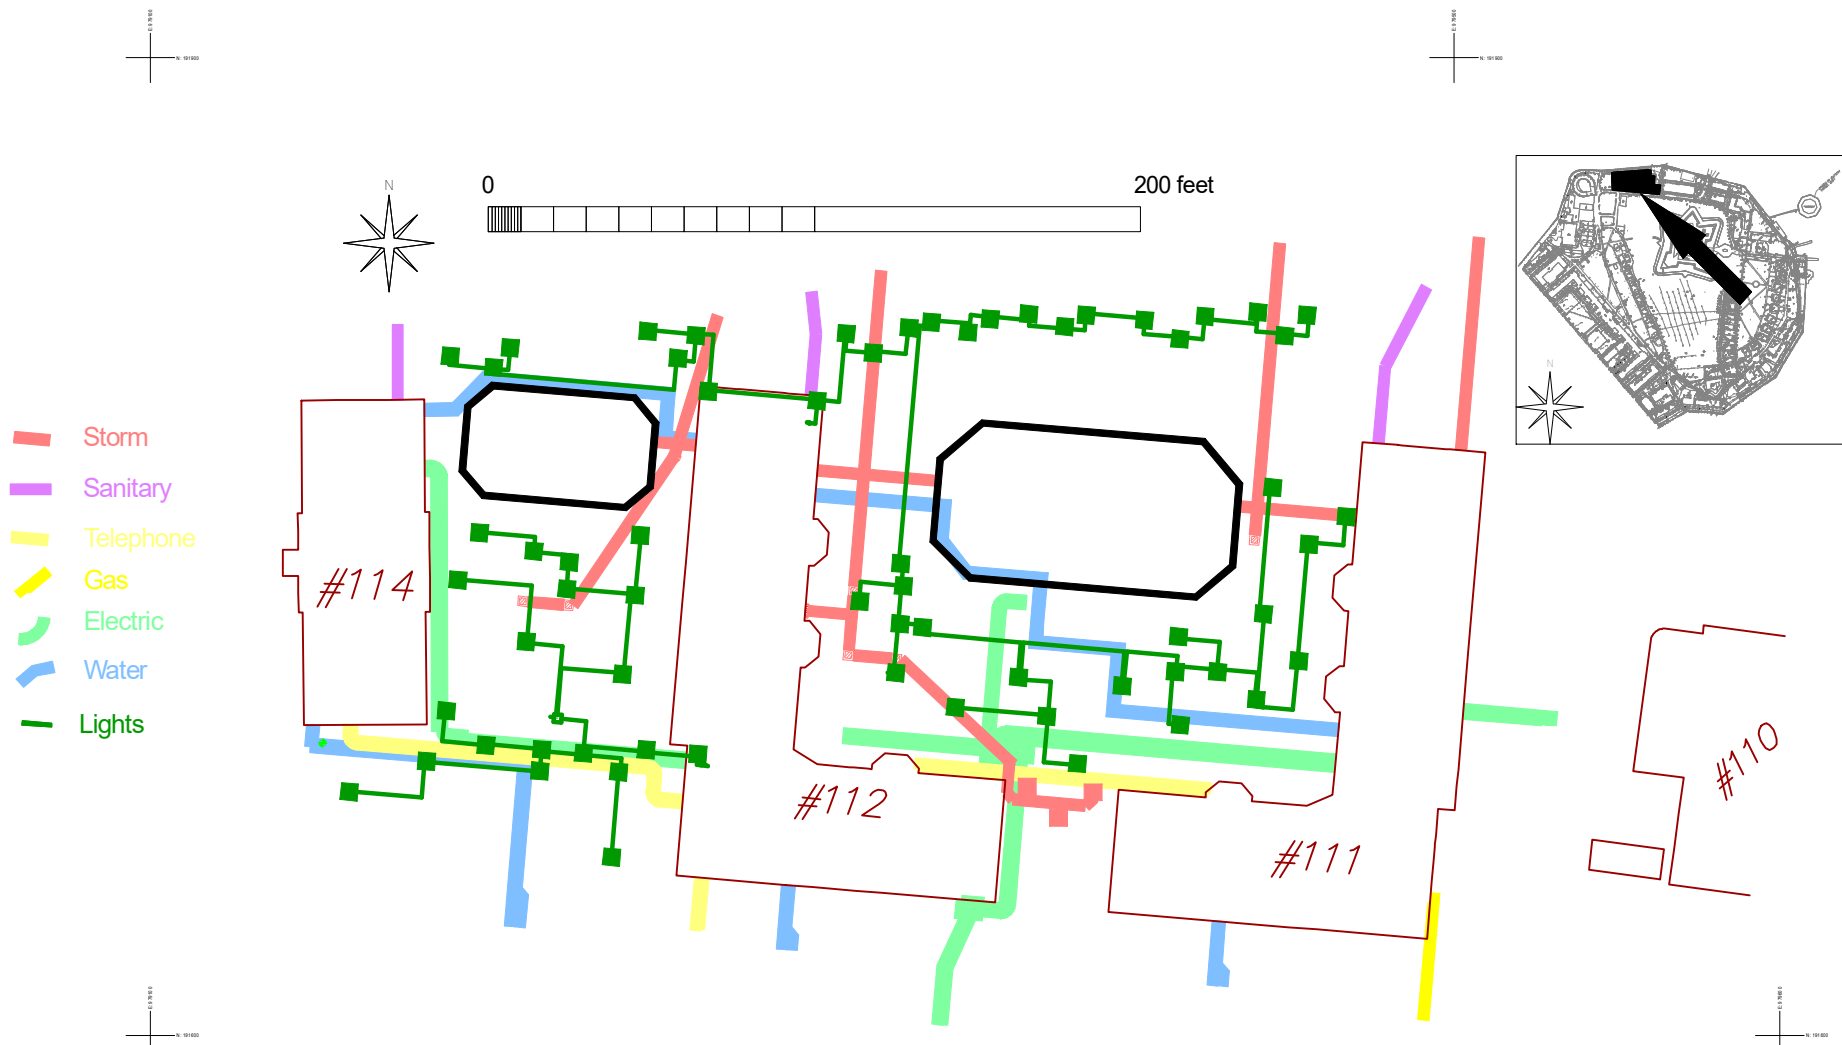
Location of planned utility excavation and pools for the Governors Island spa in and around Building #s 110, 111, 112 and 114.
